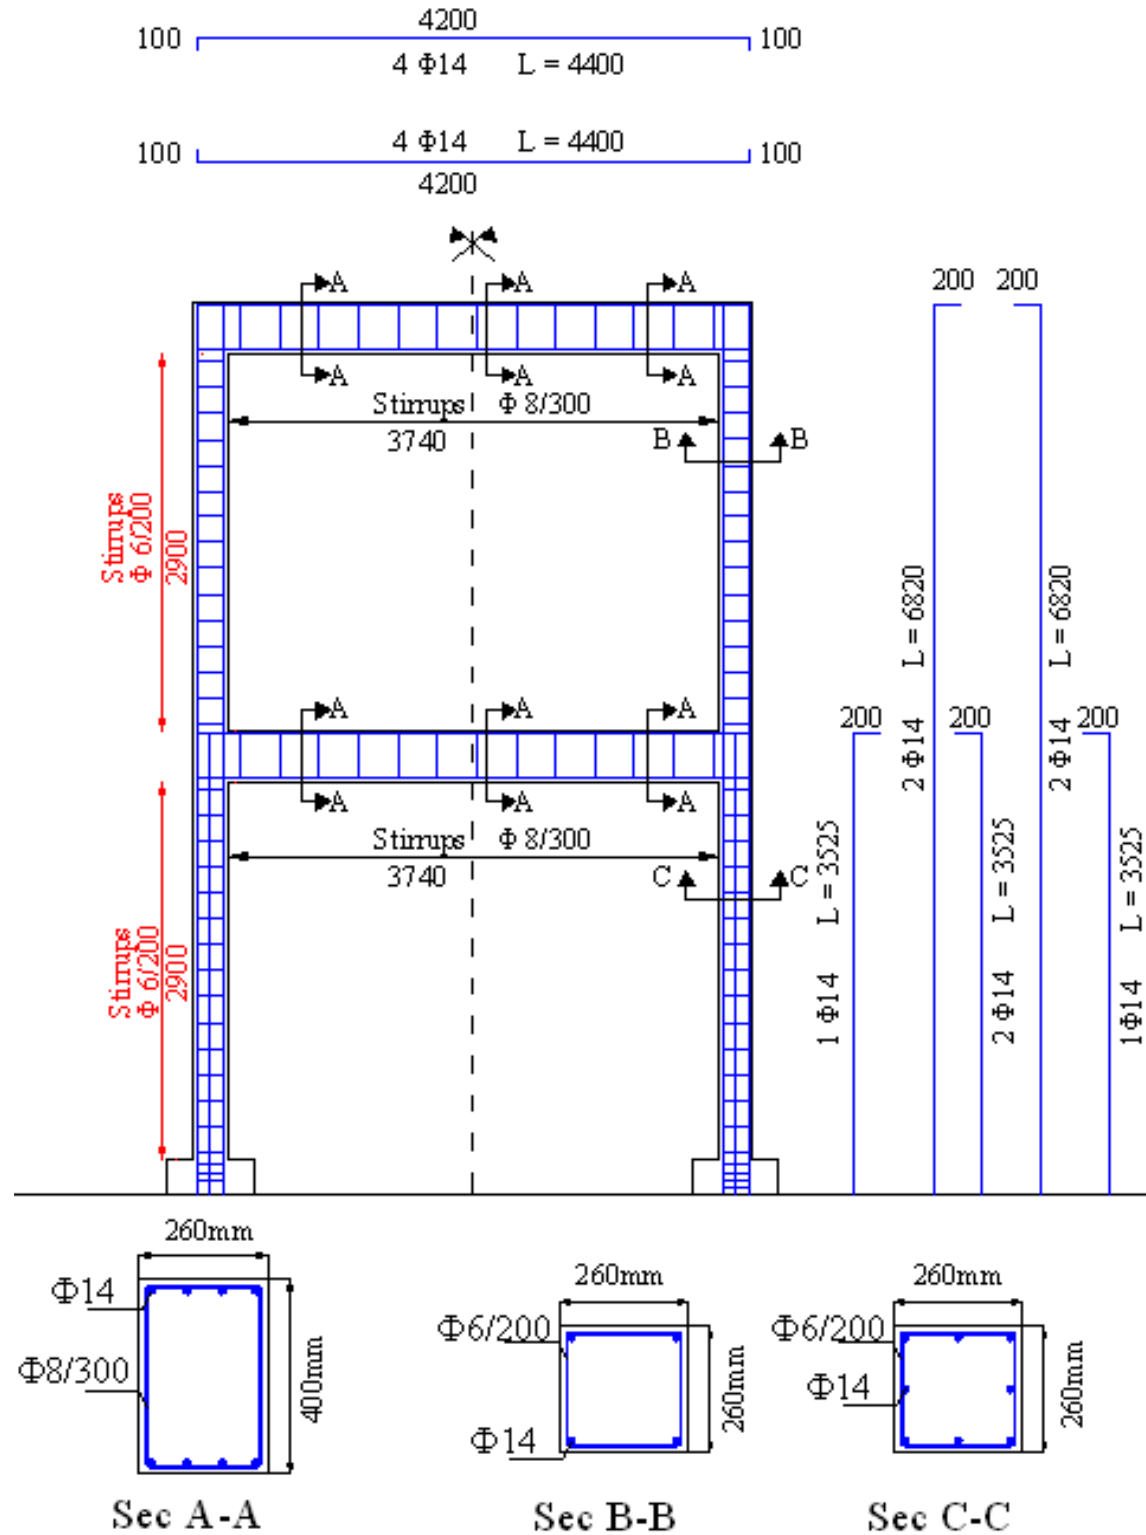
Dimensions and reinforcement details of test 1 (Chaudat et al., 2005)
